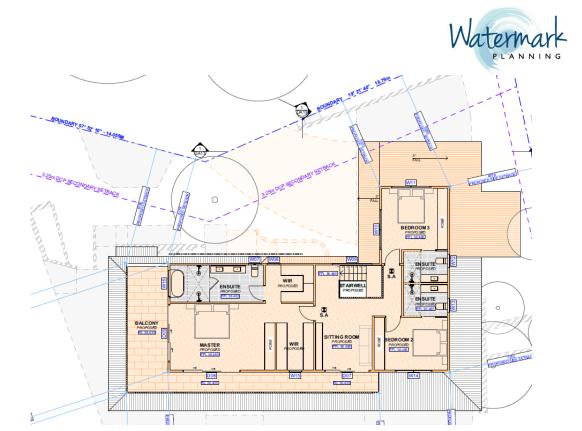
Extract from DA Plan Set (Proposed First Floor Plan, Drawing DA09) showing the proposed front setback to the new first floor level
